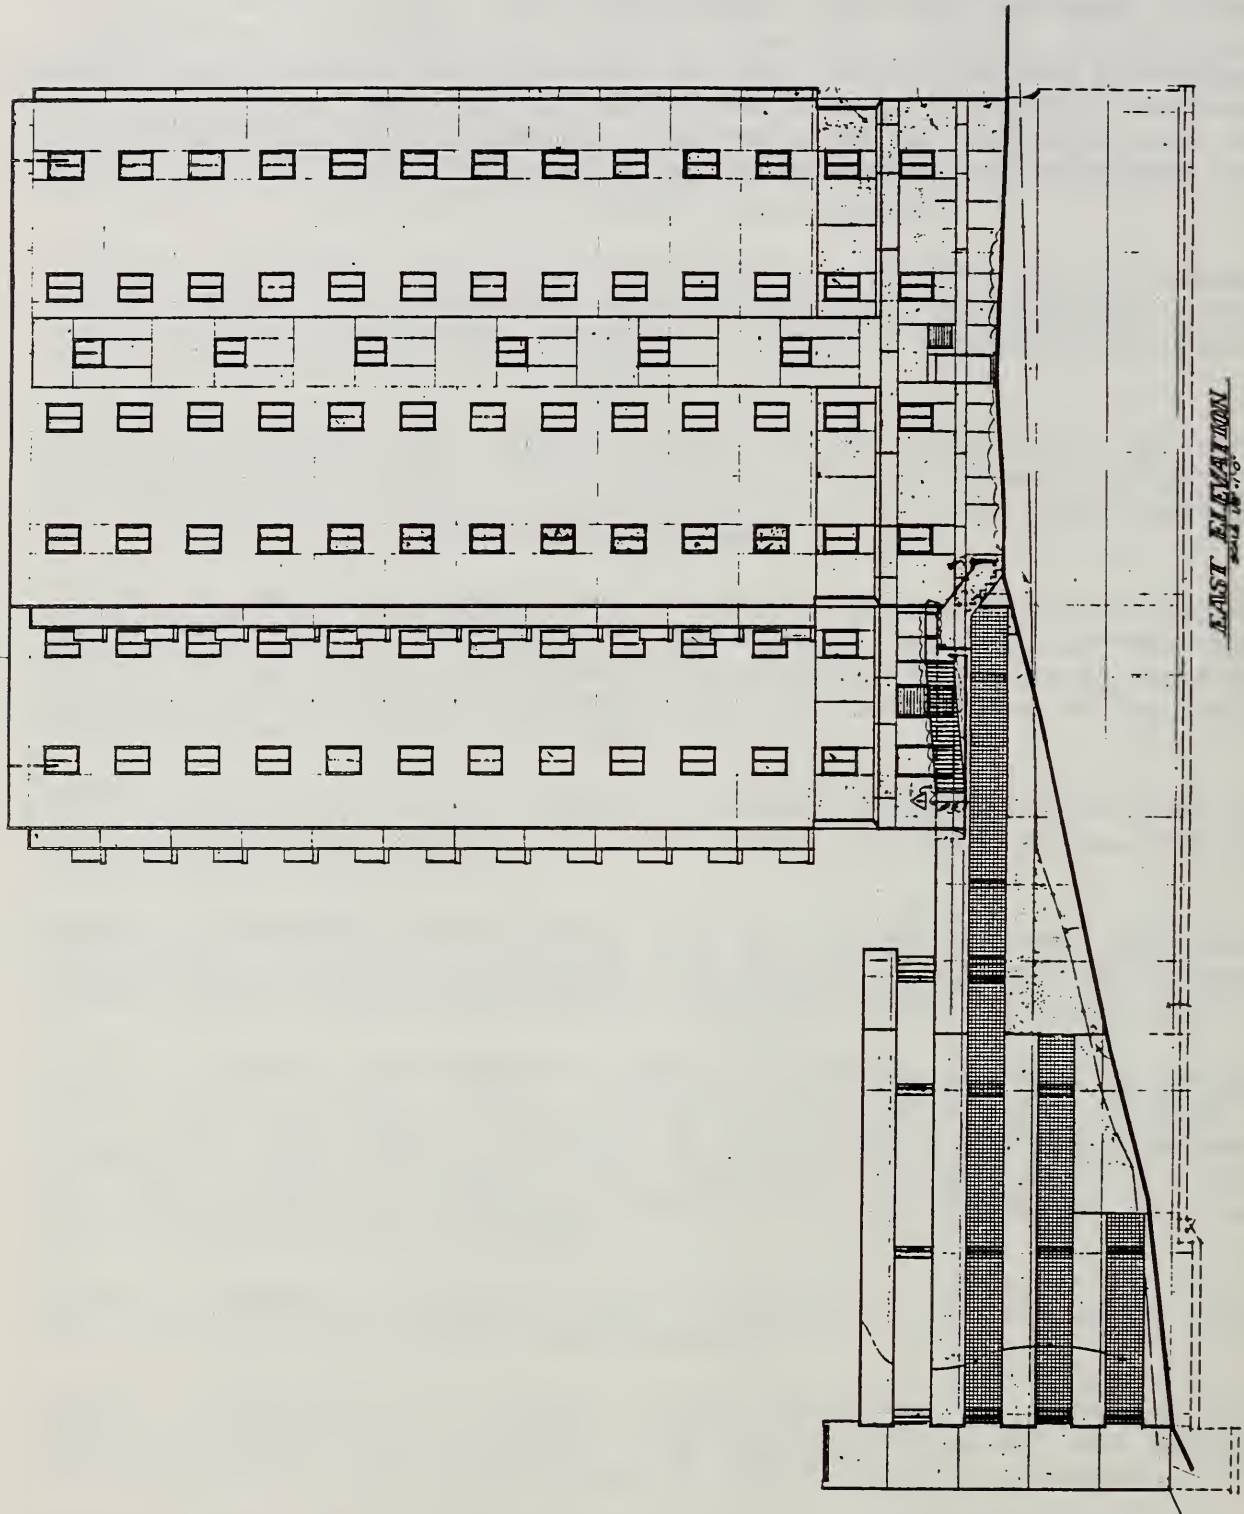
Proposed L'Ambiance Plaza Building
